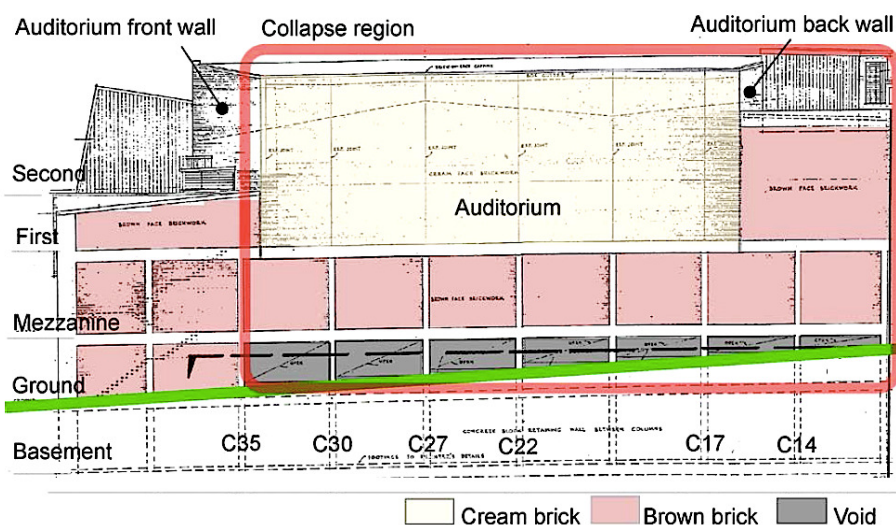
Diagram of the west wall of the NWC based on design drawings, showing column and slab layout and the collapse region (redrawn from Melchers 2011).
